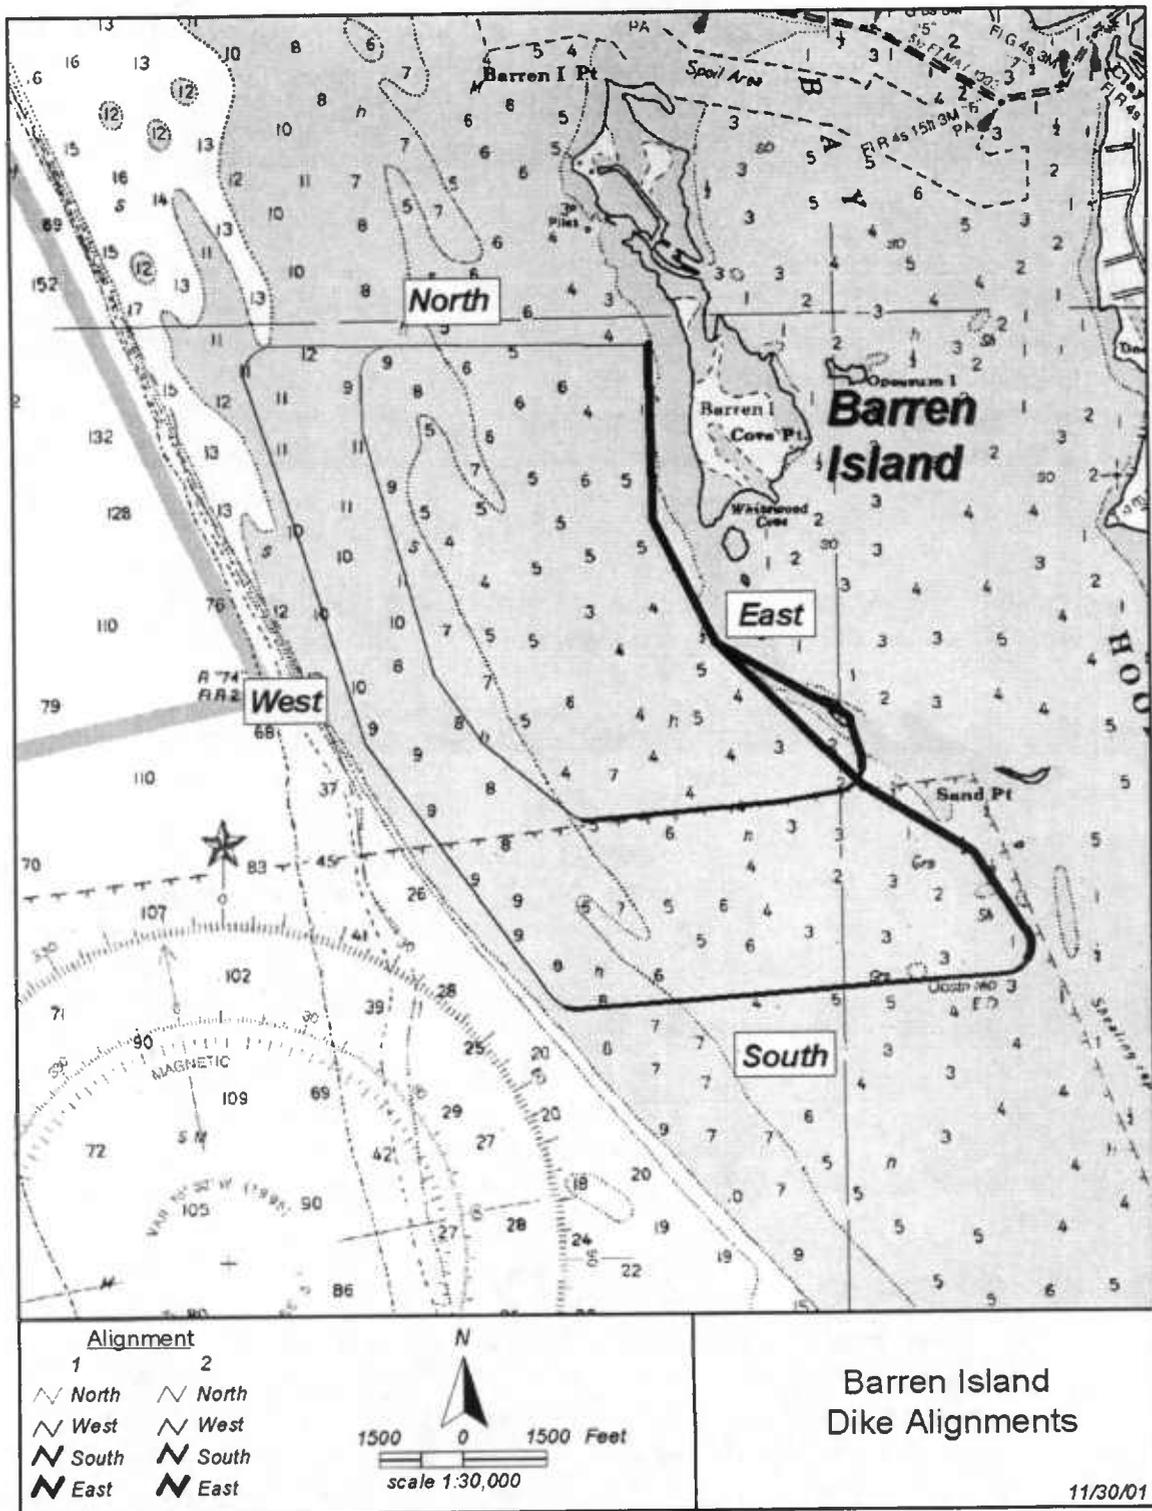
South, West, North, and East dike sections used to determine dike elevations and armor stone sizes.
